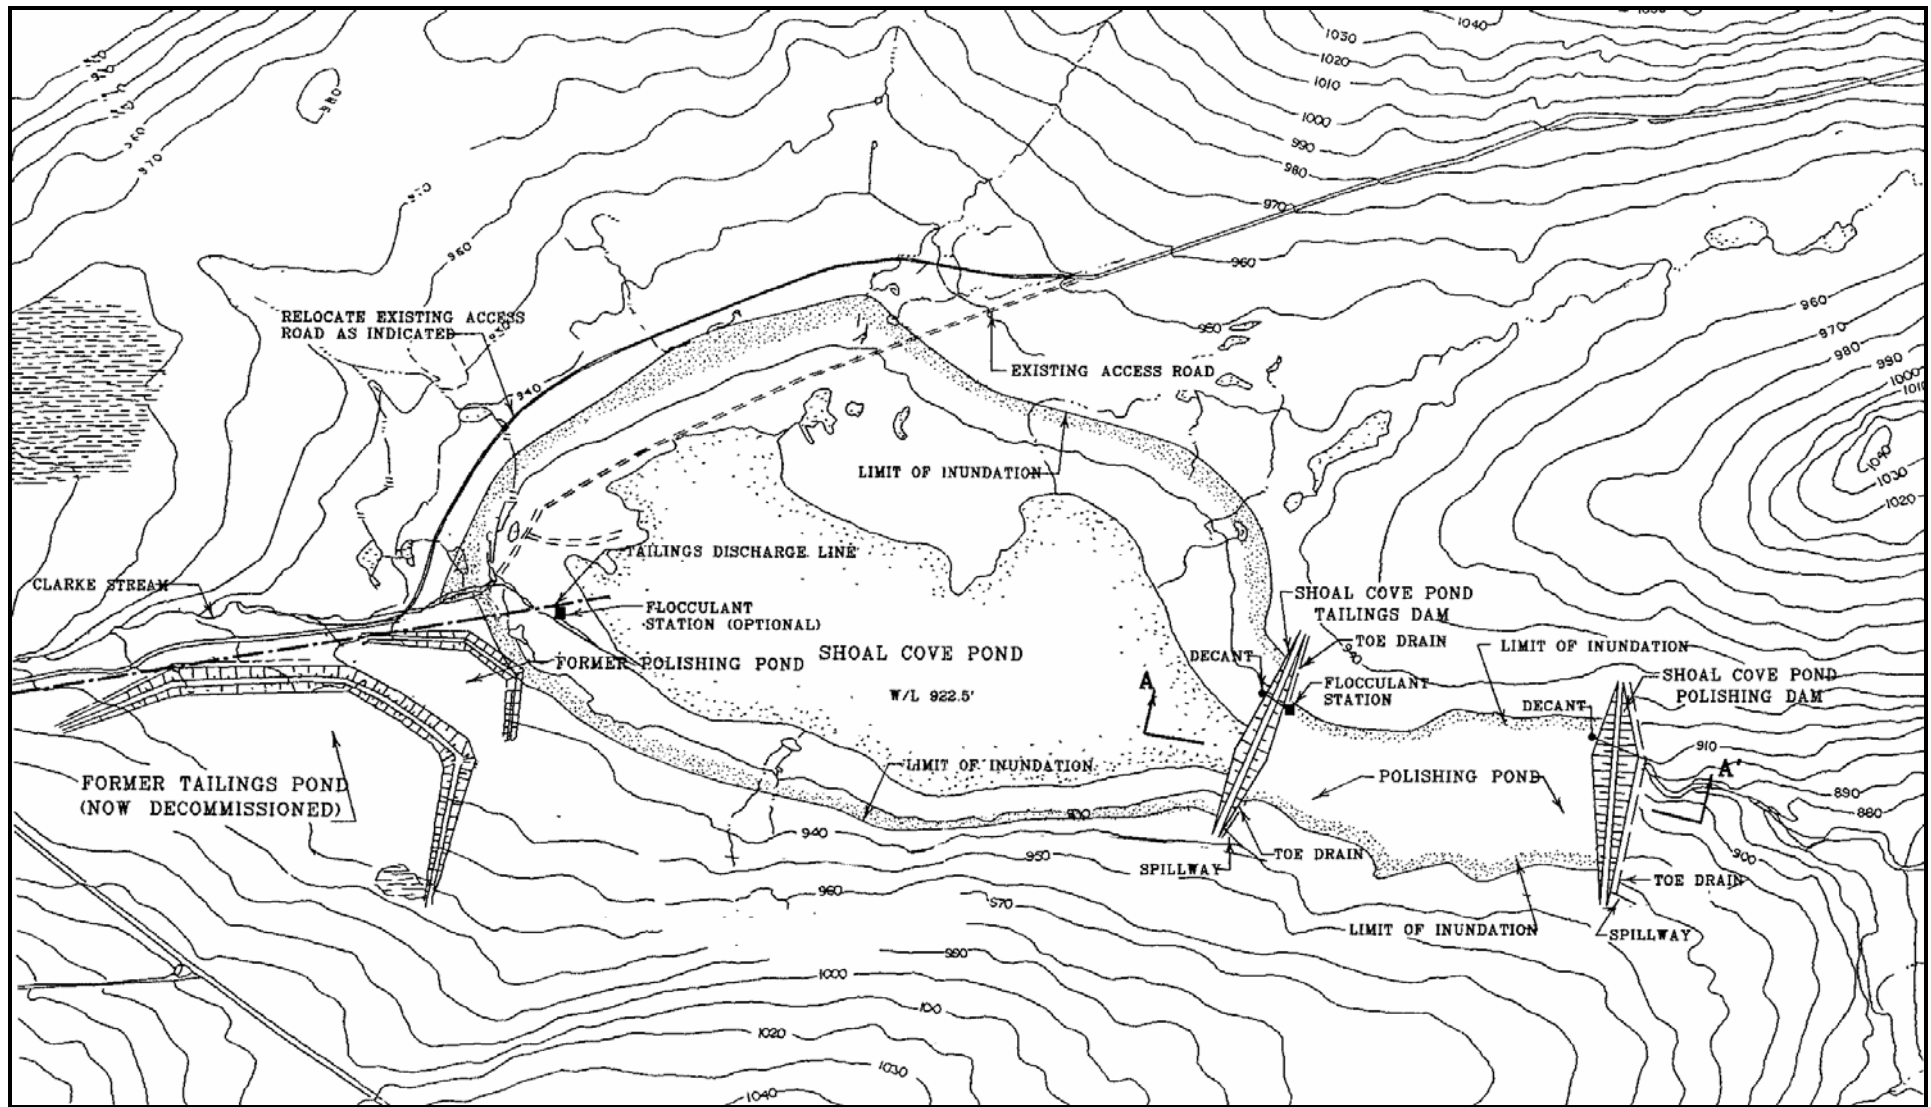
Shoal Cove Pond Tailings Disposal (1995 Design)
